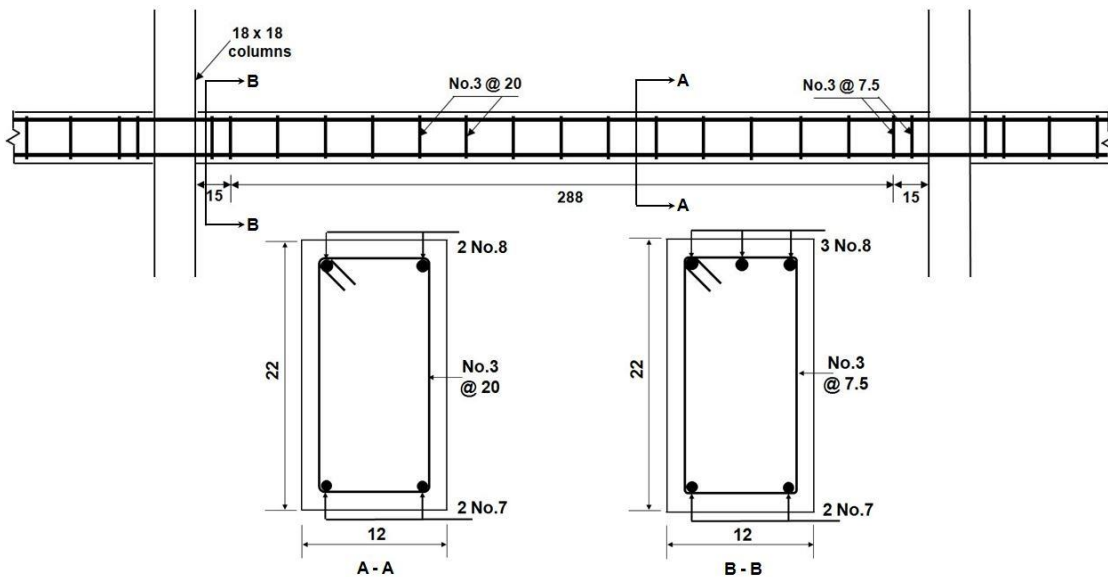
Interior floor beam design (unit of dimension: in.).
